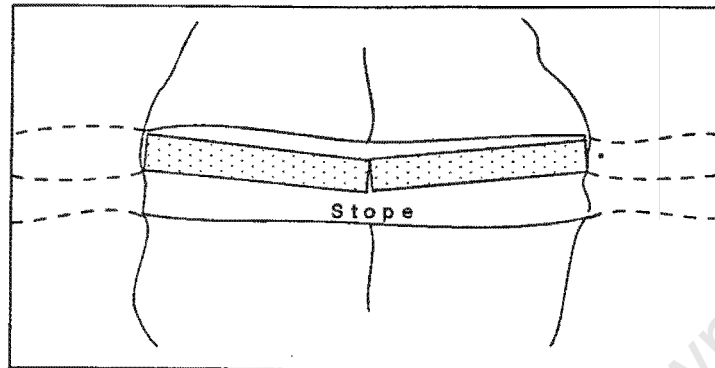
Simplified schematic of hangingwall beam in stope.
